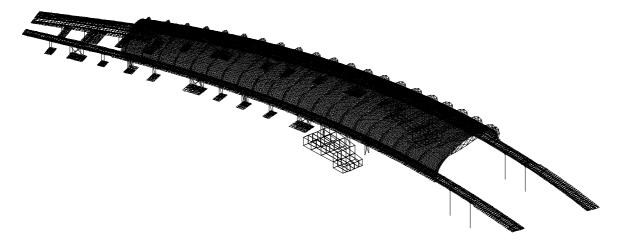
Glass-roof and railway bridges of Lehrter Bahnhof Berlin
